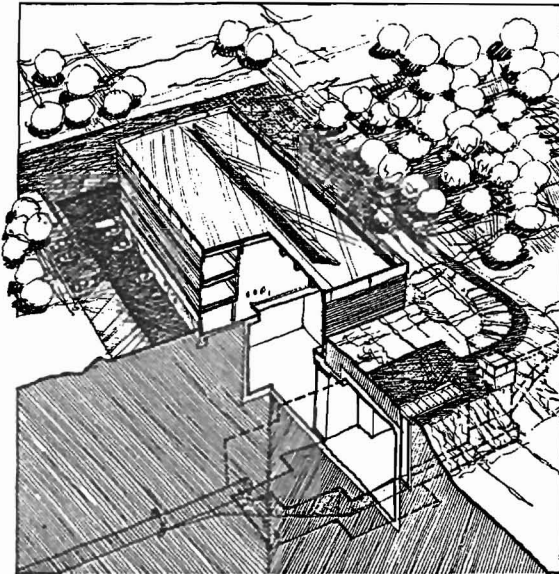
Aerial view of staging building and cut away of collision hall. The staging building is 125 feet x 300 feet.
